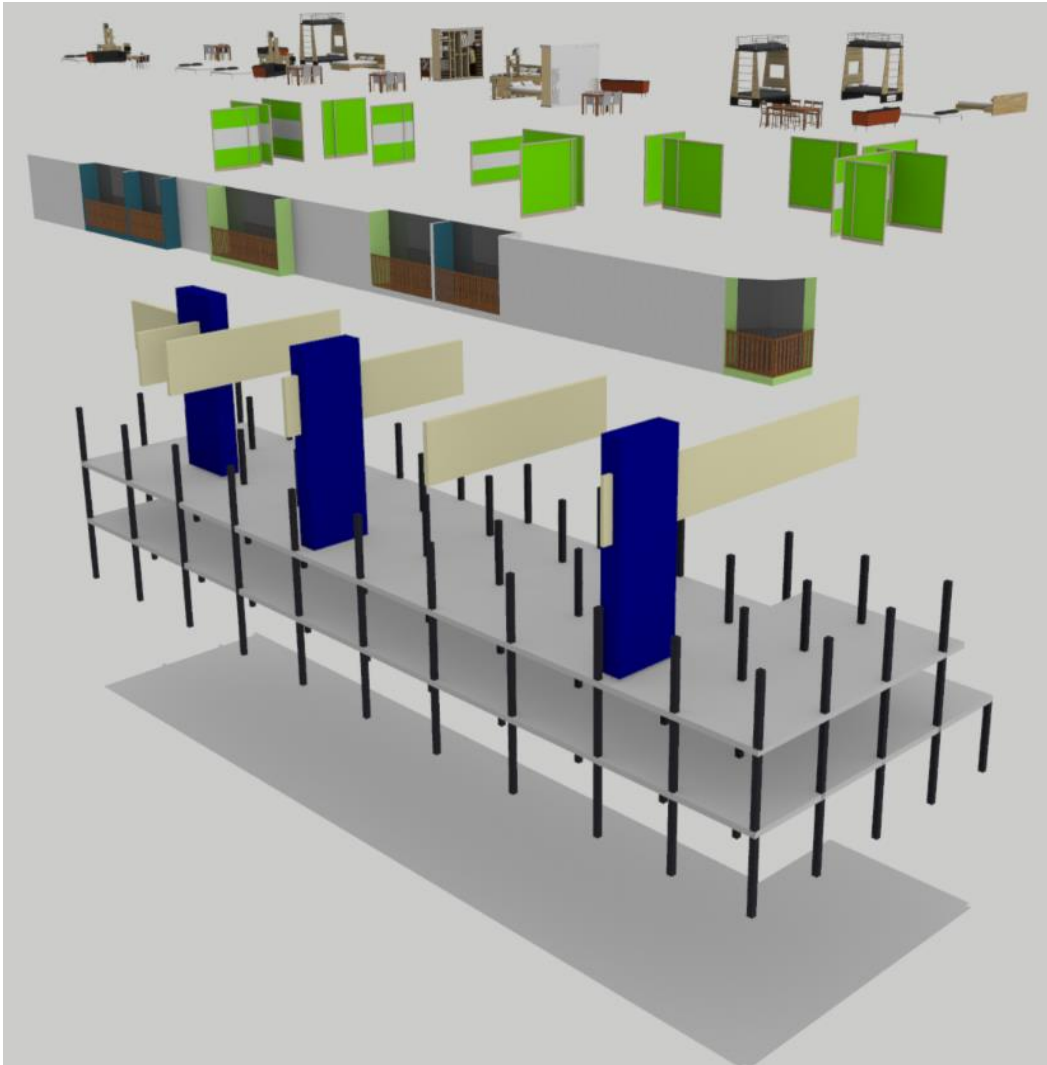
Building A Exploded Layers (From bottom to top: site, structure, system cores, unit partitions, façade, room partitions, furniture & amenities)
